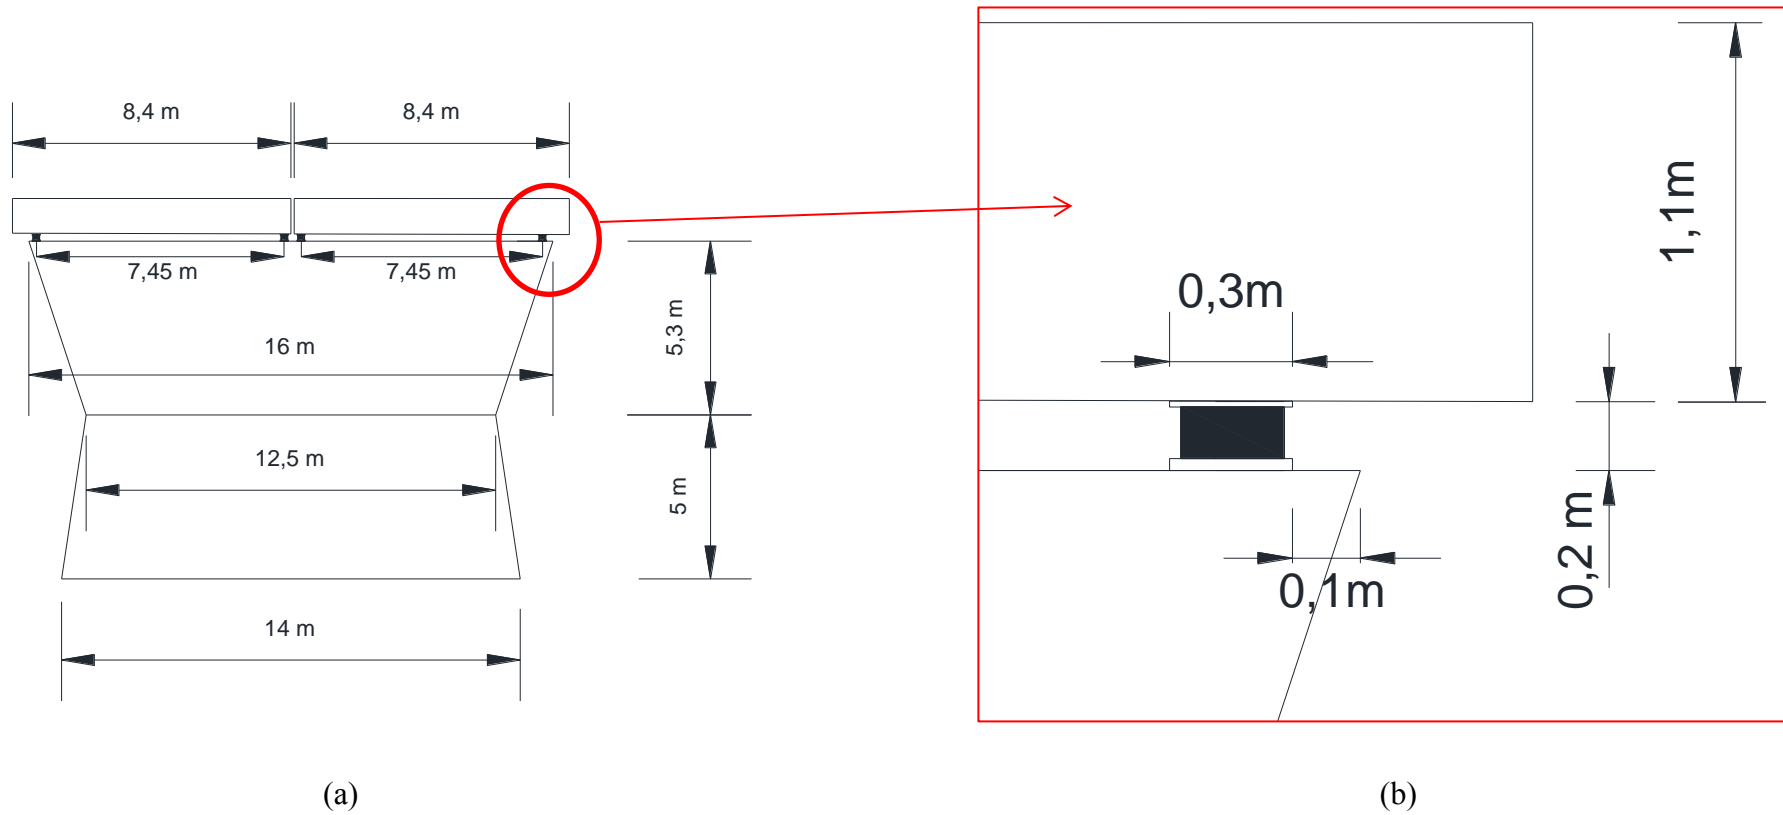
(a) West Face Abutment (b) enlarged detail of bearing (not scaled)
